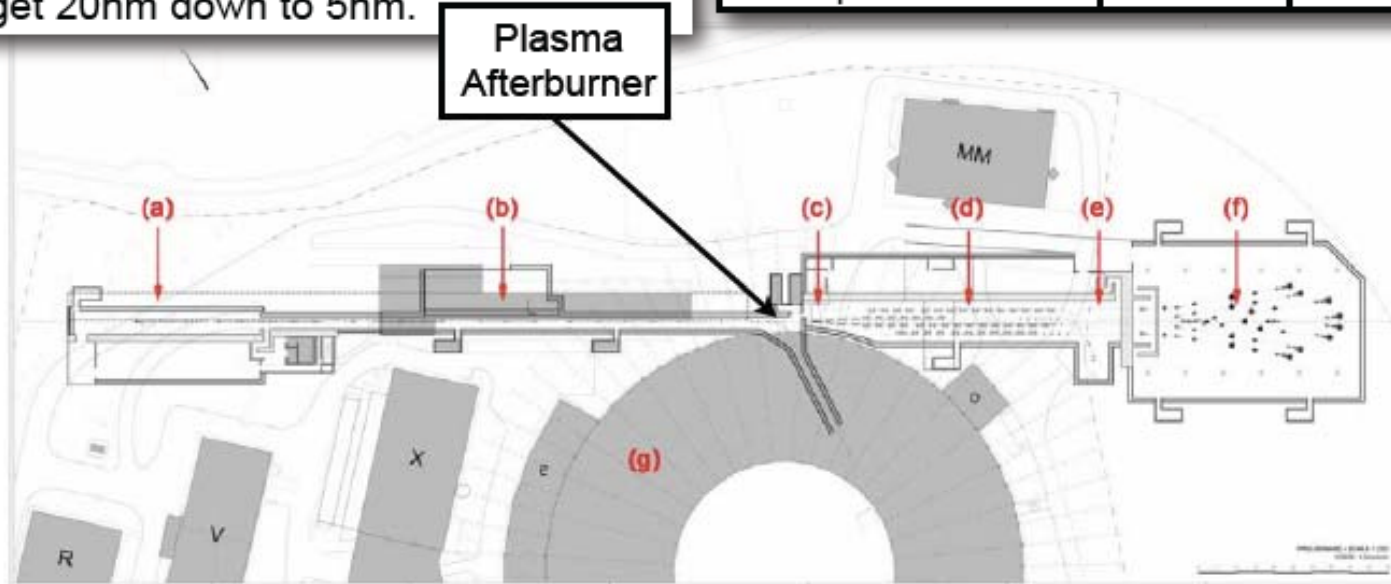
Schematic FERMI layout beside the ELETTRA storage ring building (g). See text for details.
